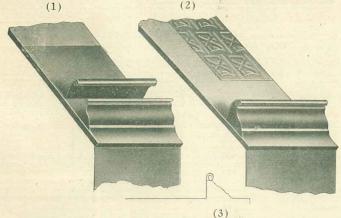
shows Face Moulding to which Gutter is to be attached. Fig. ? shows Face Moulding and Gutter locked together and inposition.
